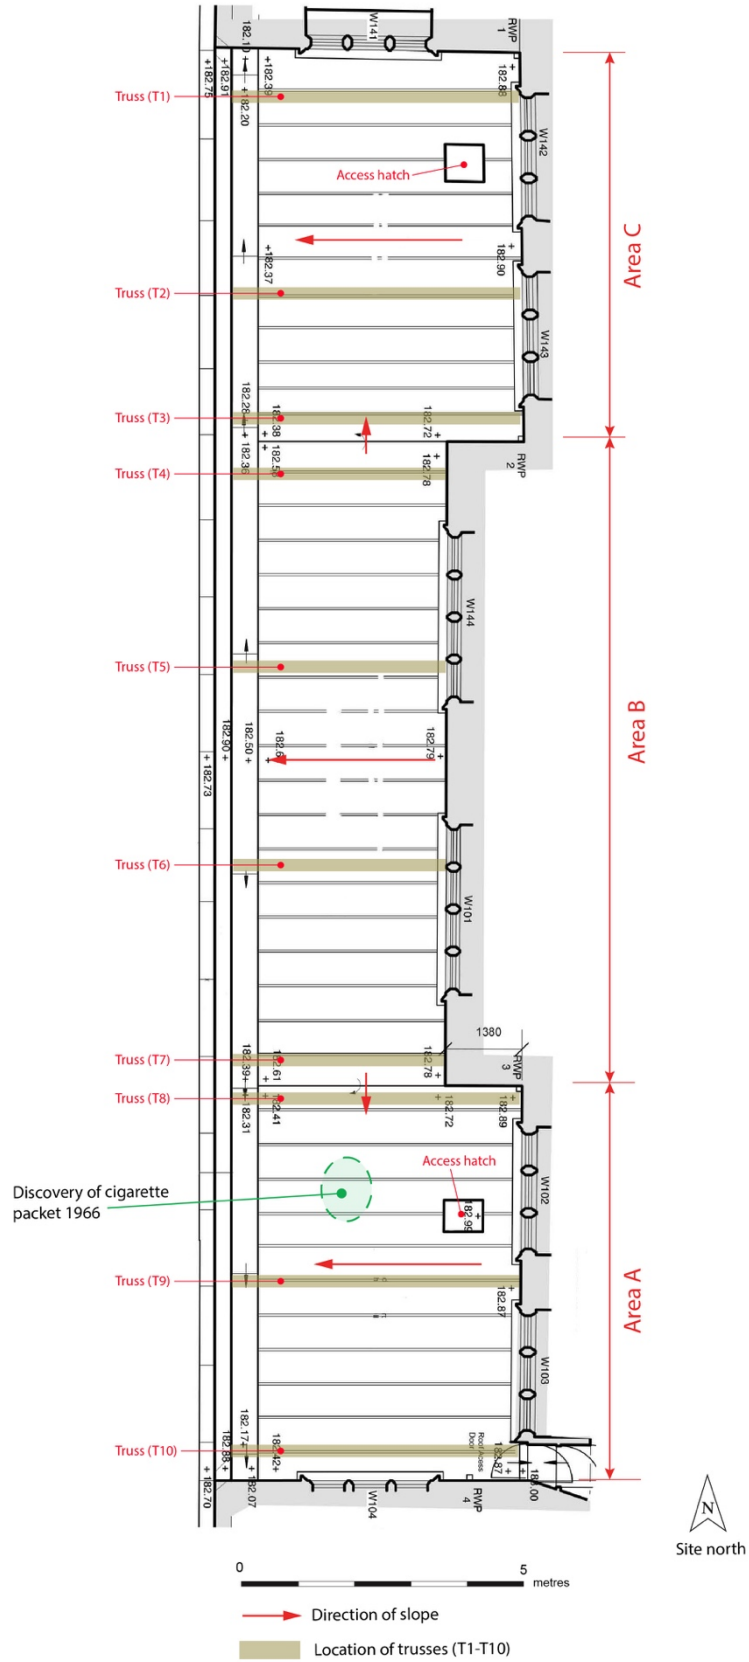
Layout of West Loggia roof (after Rodney Melville and Partners 2020)
